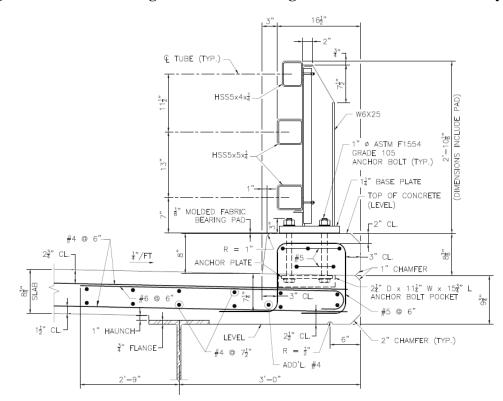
Profile drawing of the S3-TL4 bridge rail for curb-mounted system.
